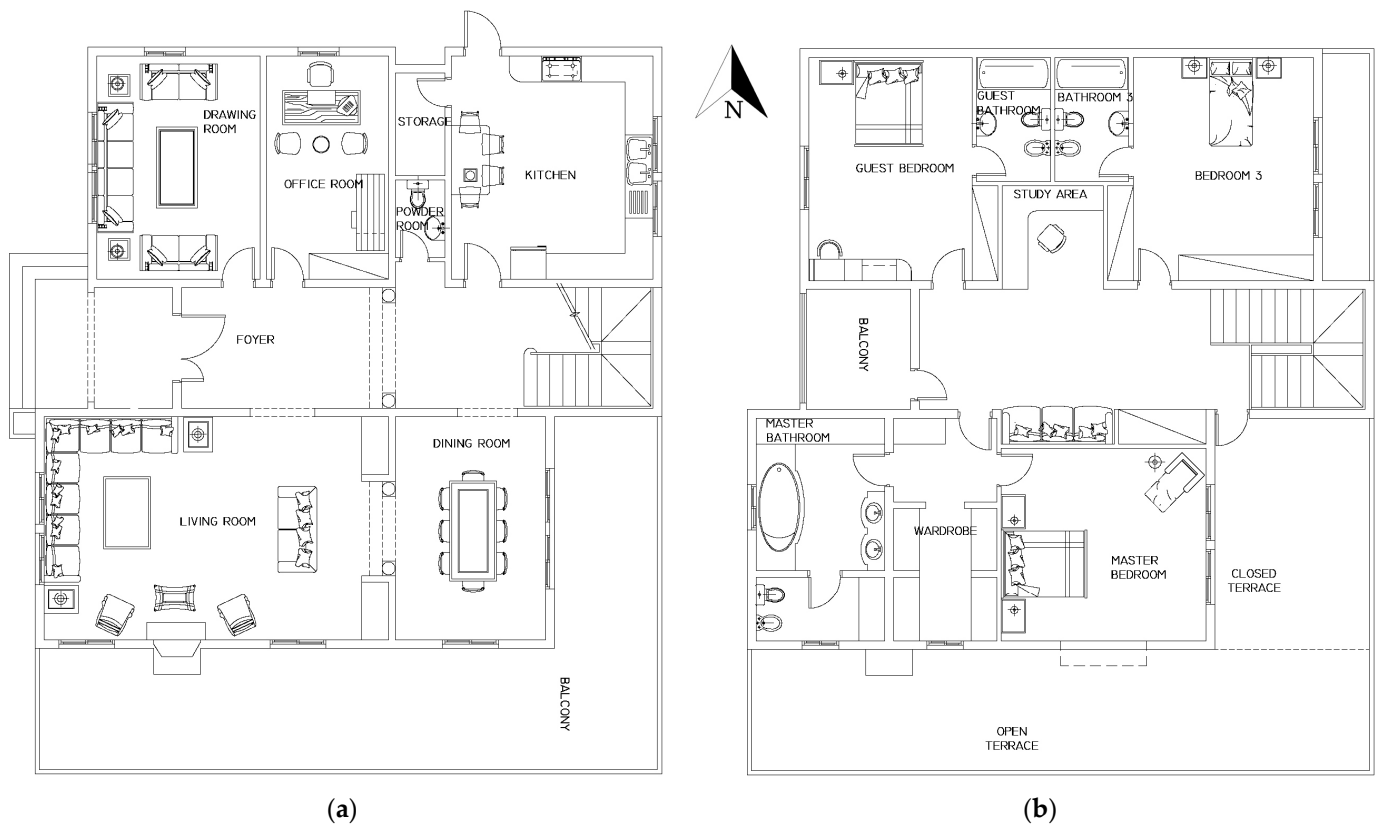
Villa floor plans (drafted by the author): (a) ground floor plan; (b) first floor plan.
